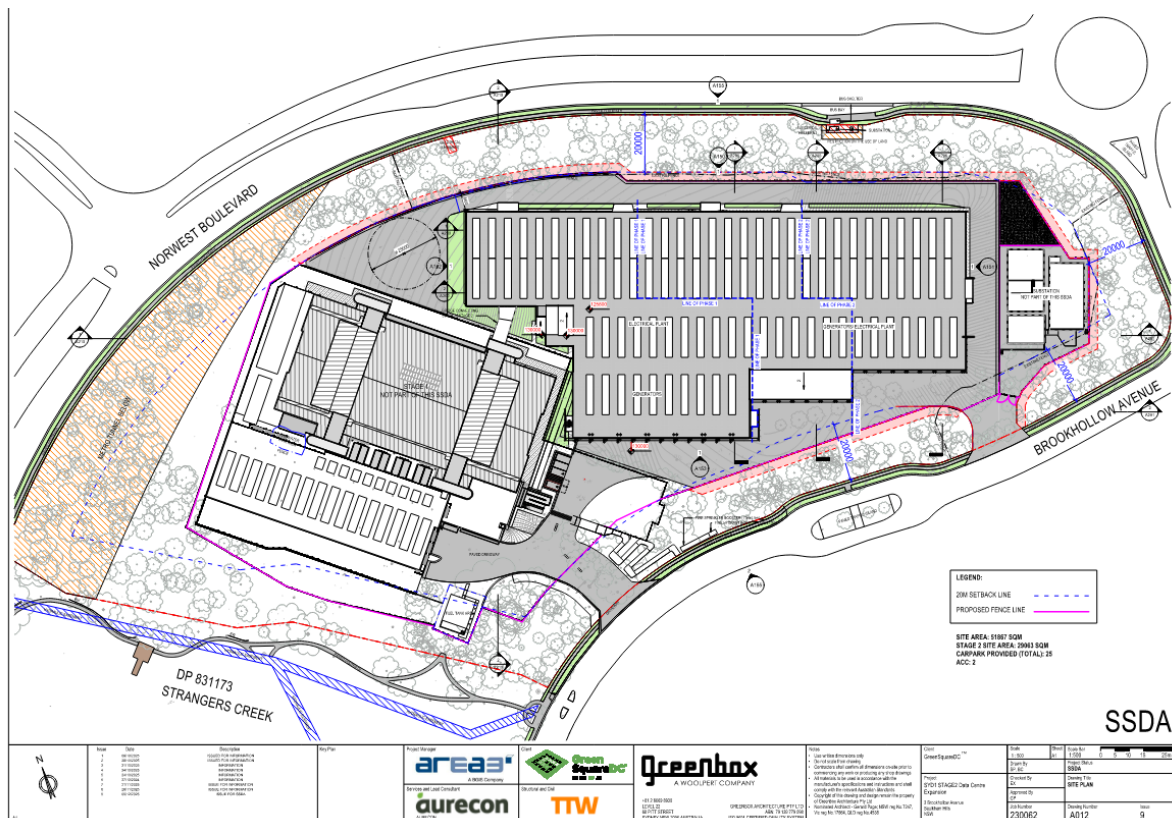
Site Plan (Source; Greenbox 05/12/2025)
